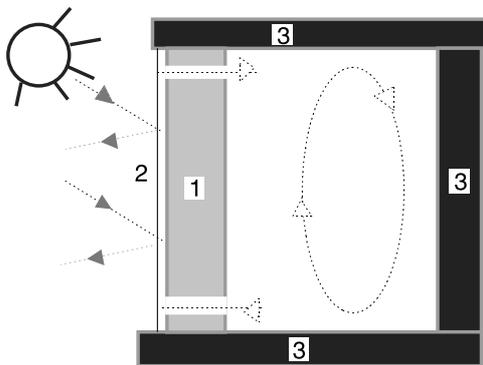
Indirect – gain system. Ventilated solar collector – storage wall.
